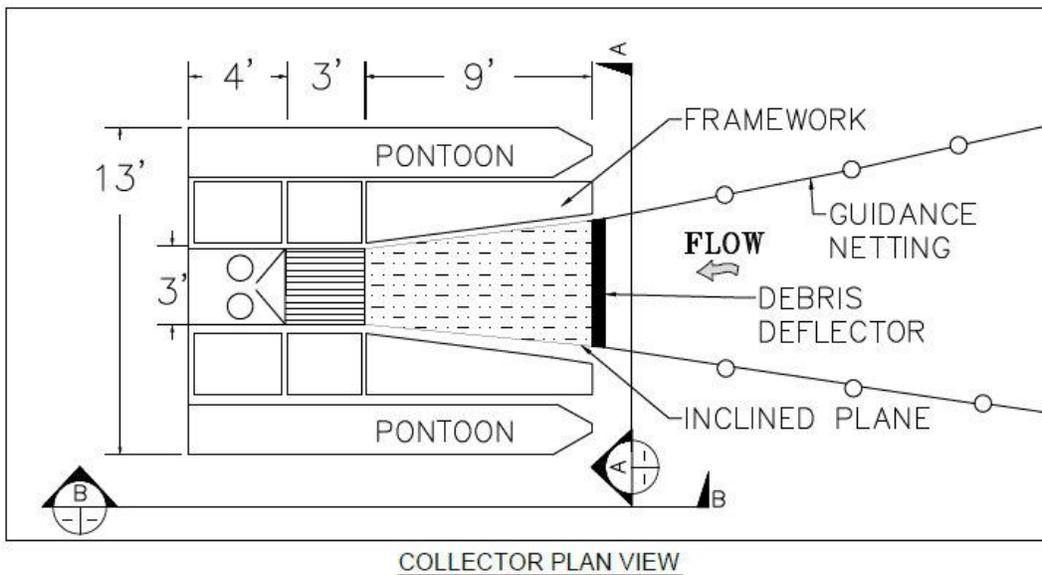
Juvenile collection trap plan view (looking down from above).
